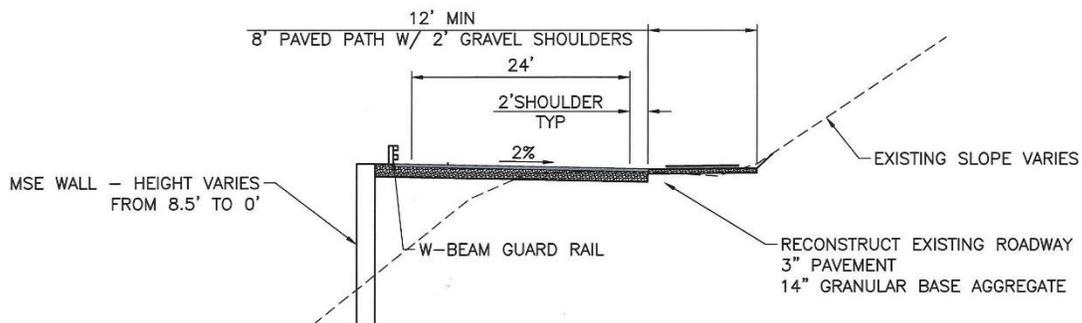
TYPICAL SECTION – ALTERNATIVE 6 - LOWER ROADWAY
